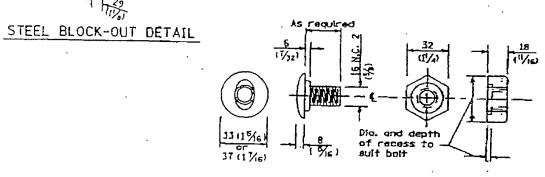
Plate A shall be placed between roll element and block-out at nonsplice gounting points only when ates! block-outs are used.
